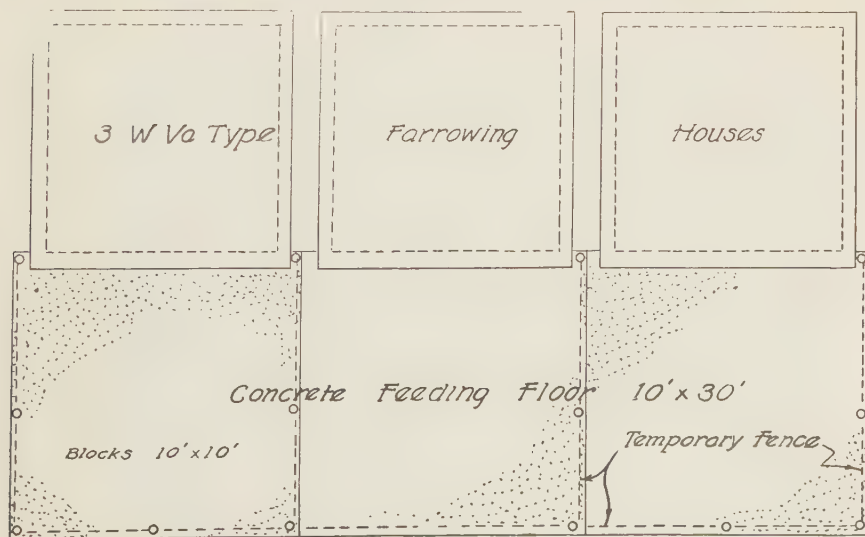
Plan showing how colony houses might be arranged about the feeding floor for winter feeding and care.
